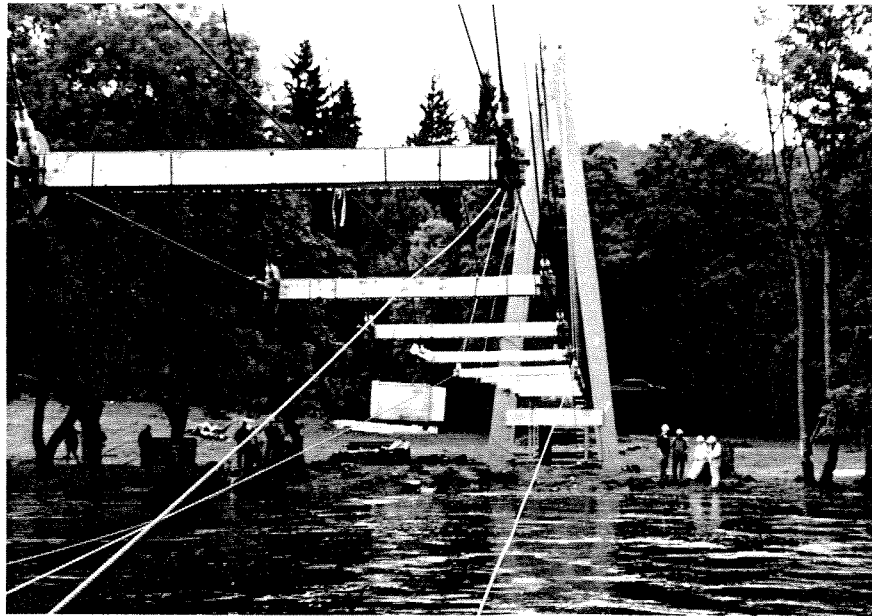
Cross beams suspended from Parafil ropes, ready for deck launch.
